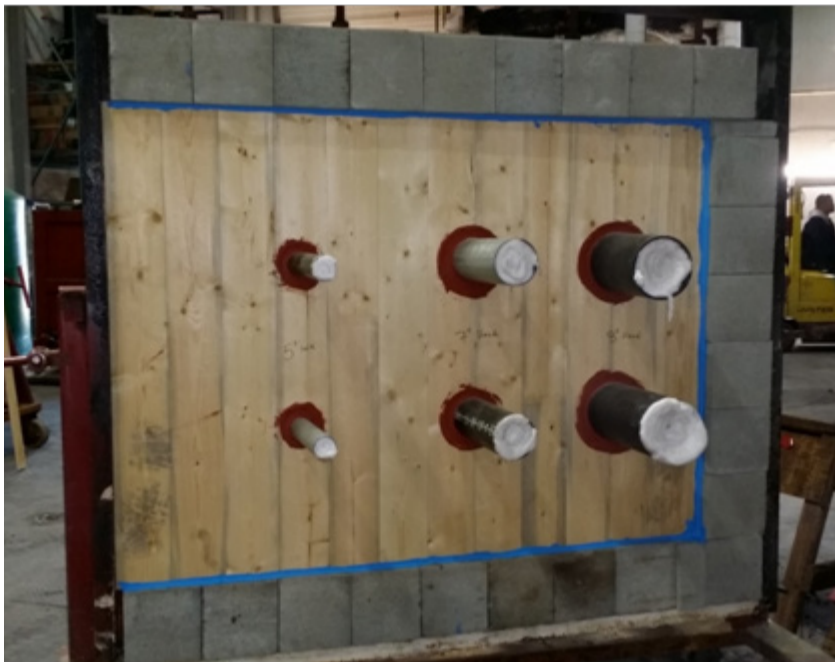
Firestop test assembly (exposed side) prior to test consisting of CLT wall assembly with 6 metal pipes of different materials and sizes penetrating the assembly
